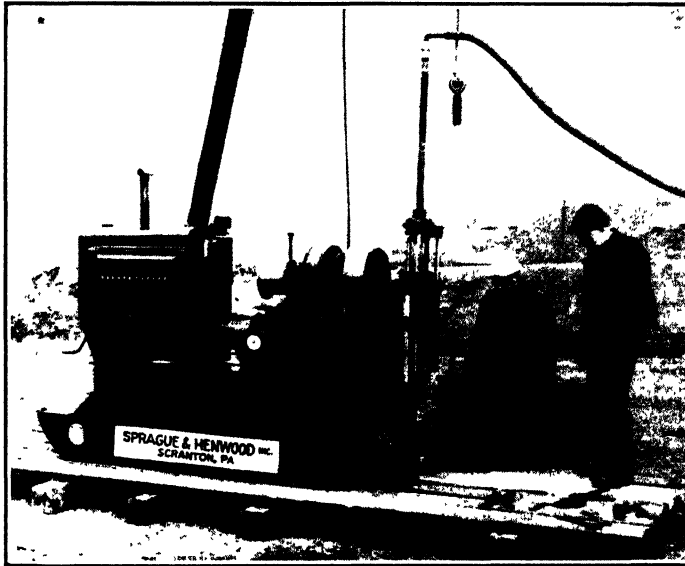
Photograph of the core-boring machine shown in cross section in Fig. 12-15. (Courtesy of Sprague & Henwood, Inc.)
